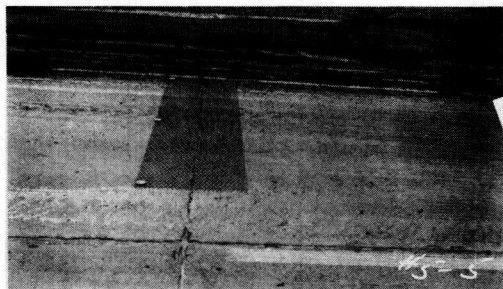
2-foot wide sheet fastened along leading edge. Paver approaches from left.
